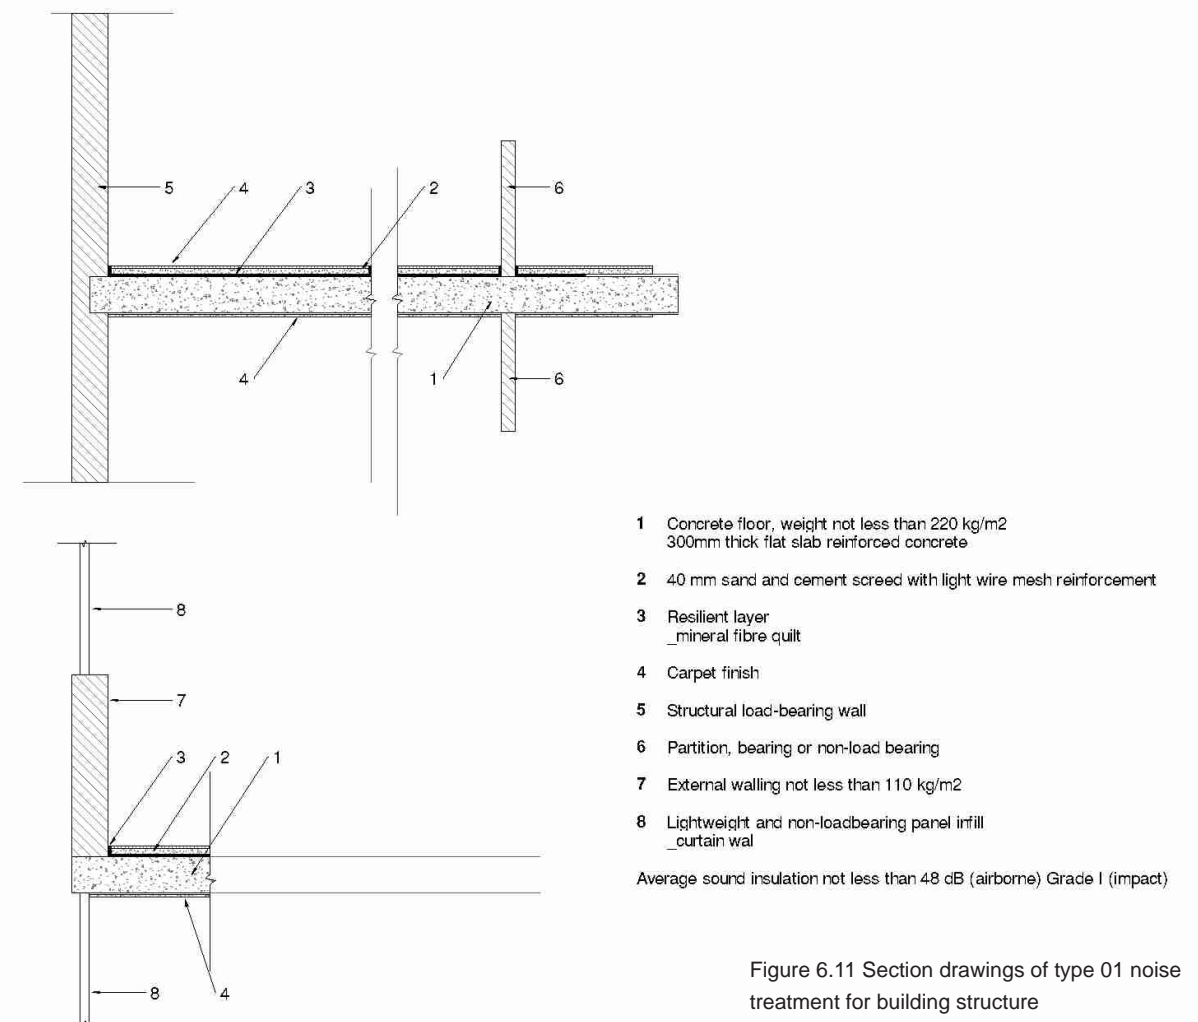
Section drawings of type O1 noise treatment for building structure
